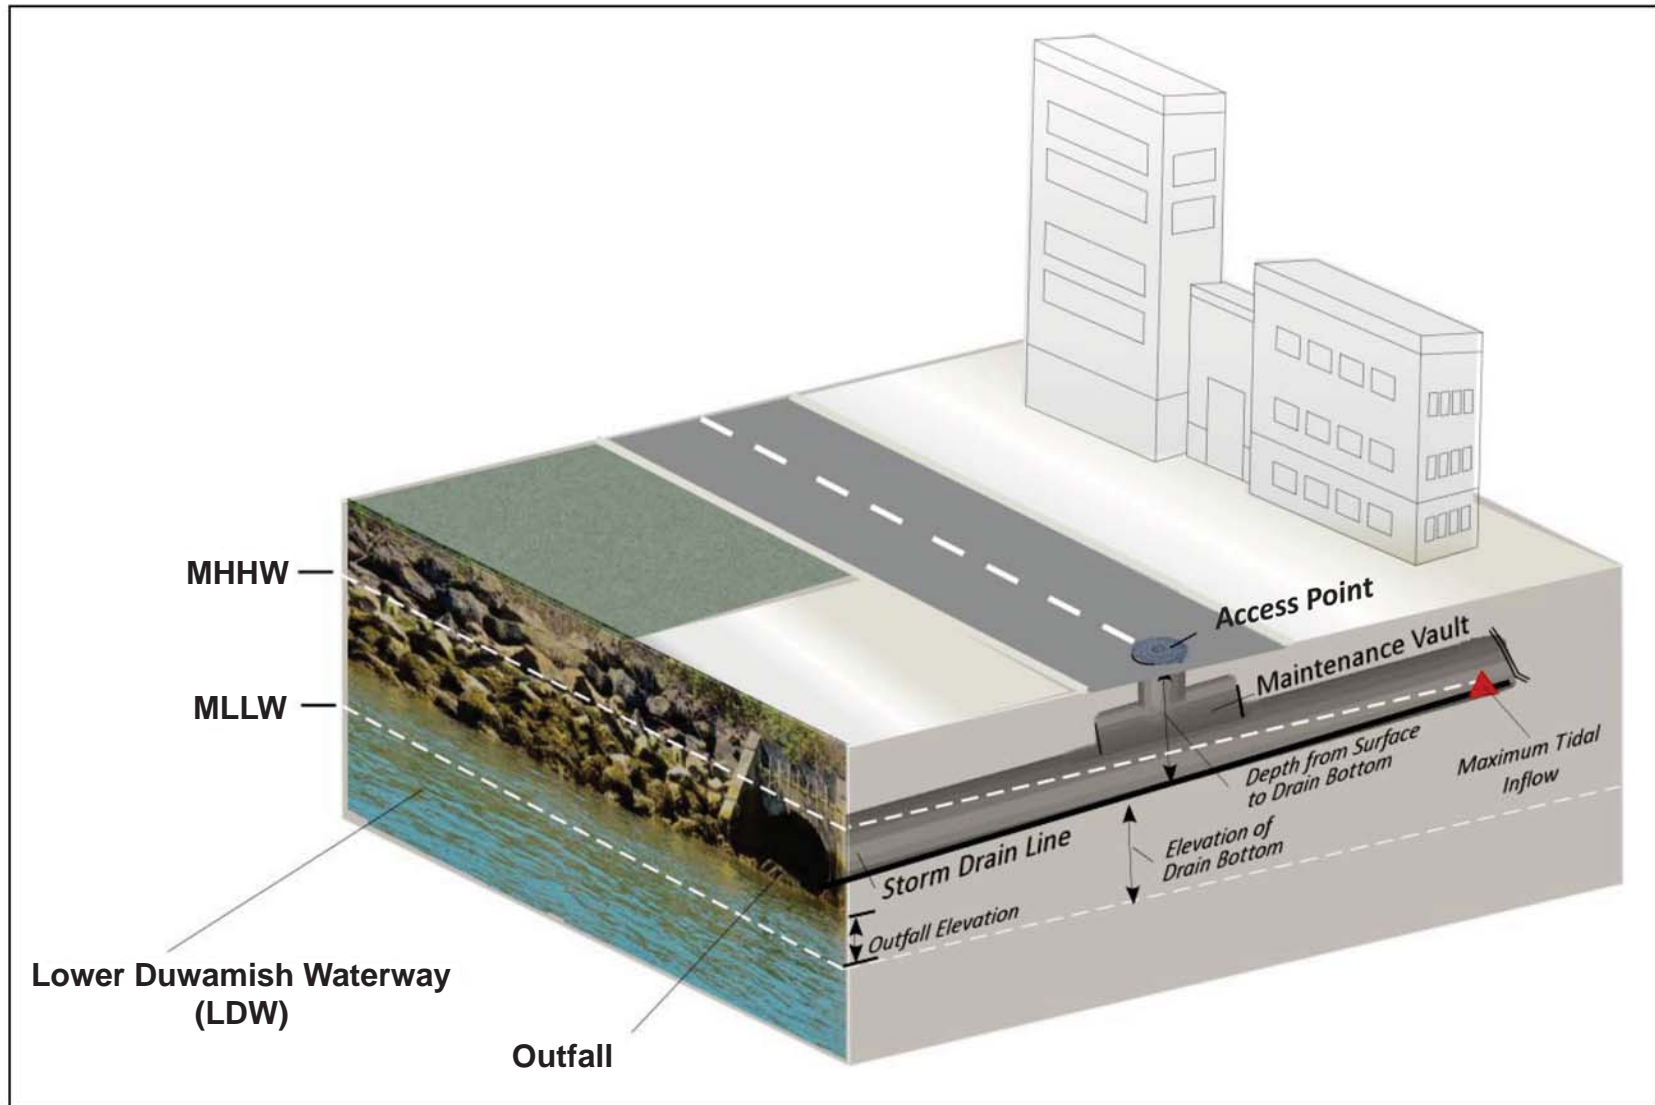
Schematic of a Typical LDW Storm Drain Line and Outfall
